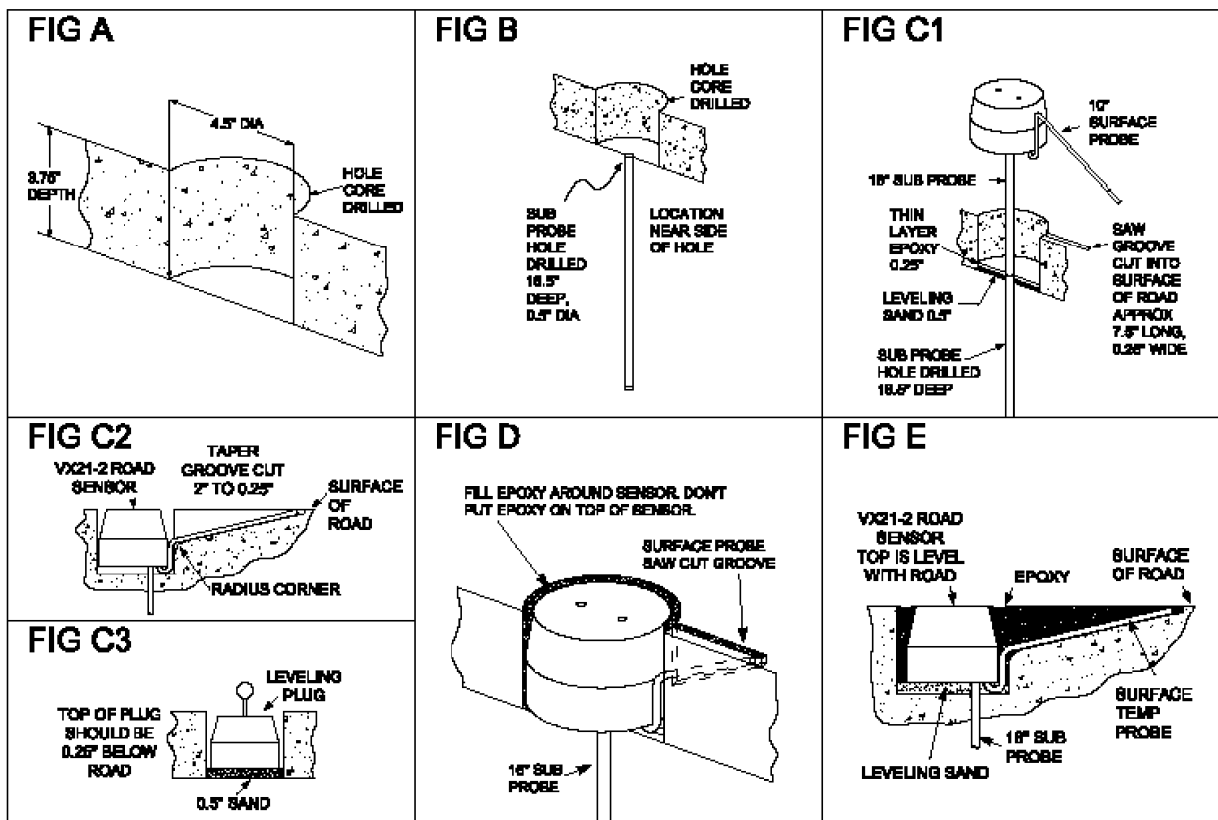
FIG B) DRILL SUB TEMP PROBE HOLE 16.5" DEEP INTO THE BEDROCK OF THE ROAD NEAR THE EDGE OF THE BOTTOM HOLE. (USE A 5" DIAMETER DRILL BIT). USE VACUUM TO CLEAN OUT SUB TEMP PROBE HOLE.
